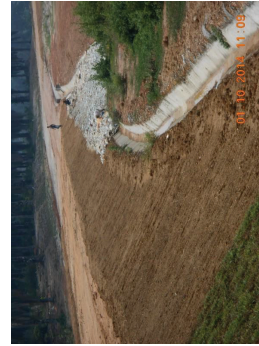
(Before): Exposed slope has yet to be vegetated (relocation road).
